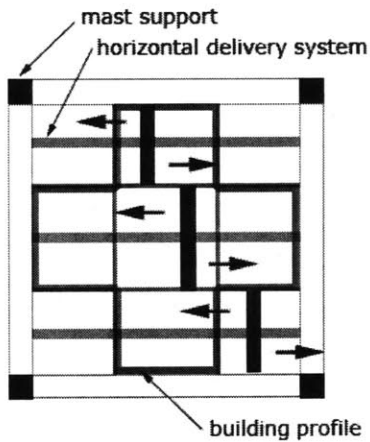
SMART building system - Shimizu Corporation, Japan
